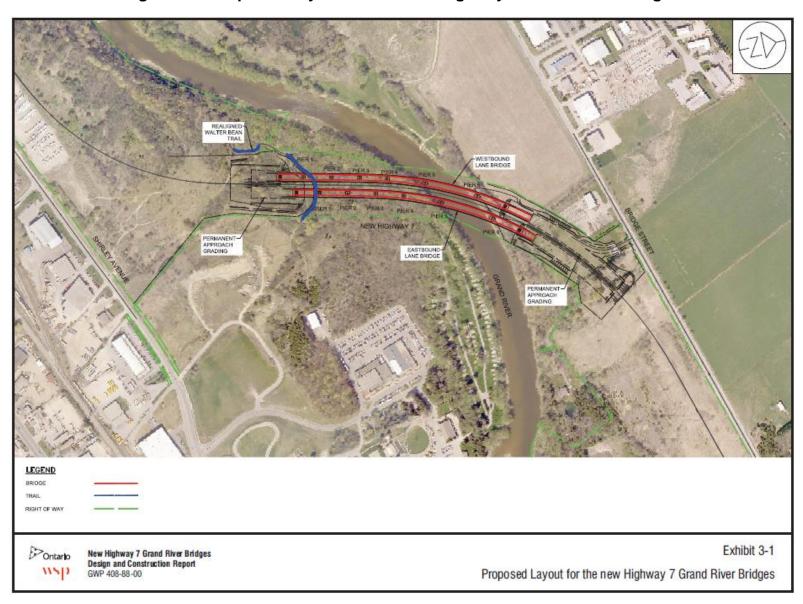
Proposed Layout for the New Highway 7 Grand River Bridges
